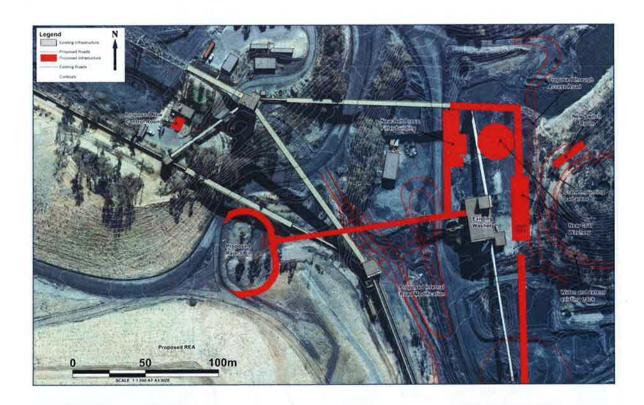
General layout of proposed upgrade to the CHPP on the SCSS
